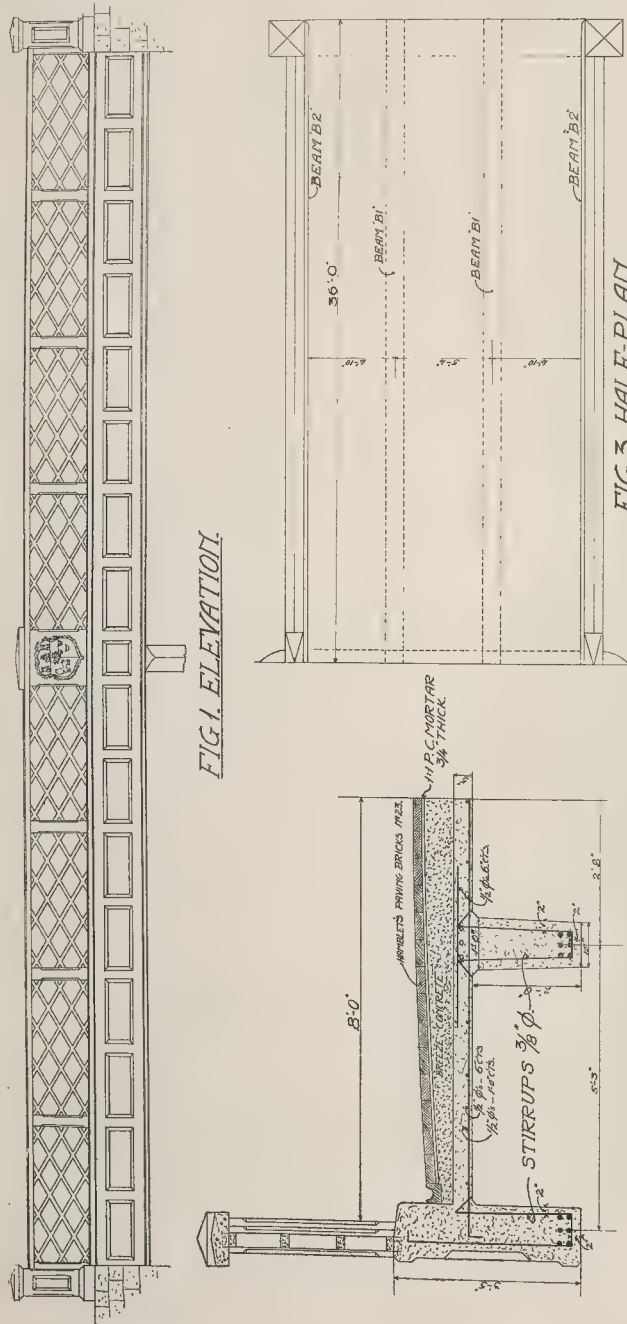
ELEVATION. FIG. 2. HALF-SECTION. FIG. 3. HALF-PLAN.
